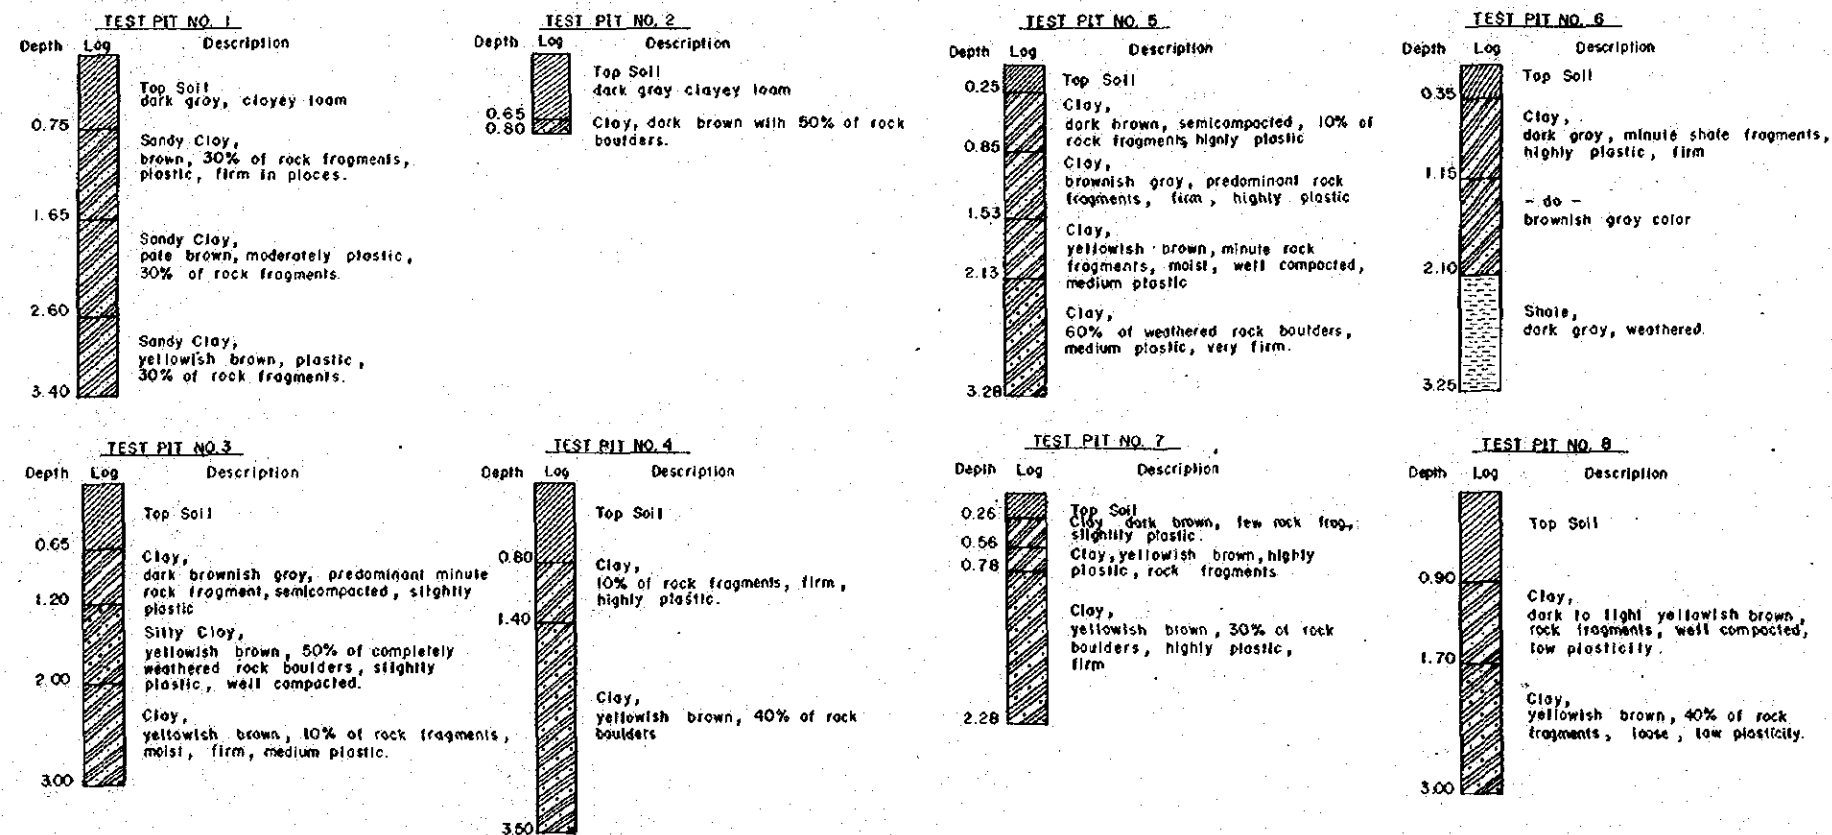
D-8 TEST PITS LOG AT PLANED WAHIG DAM SITE
